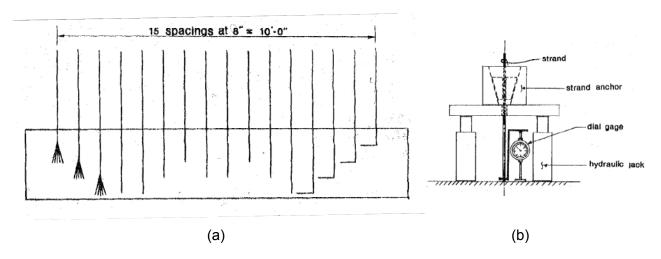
(a) CTA test specimen arrangement (b) CTA test setup (Moustafa, 1974).
